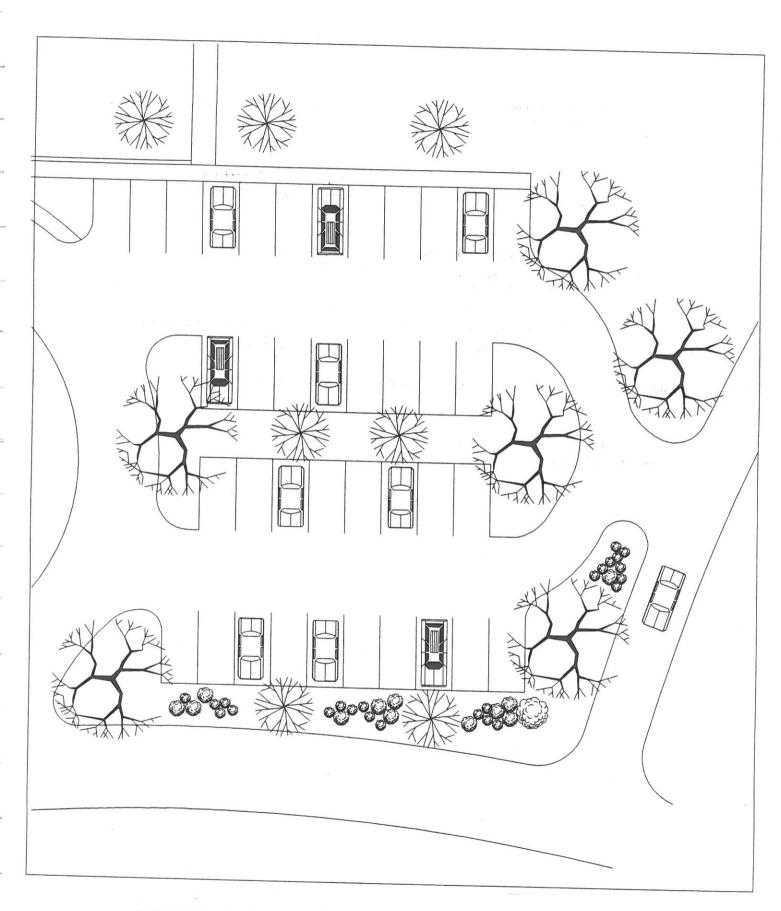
Parking Area Perimeter and Interior Planting Requirements
